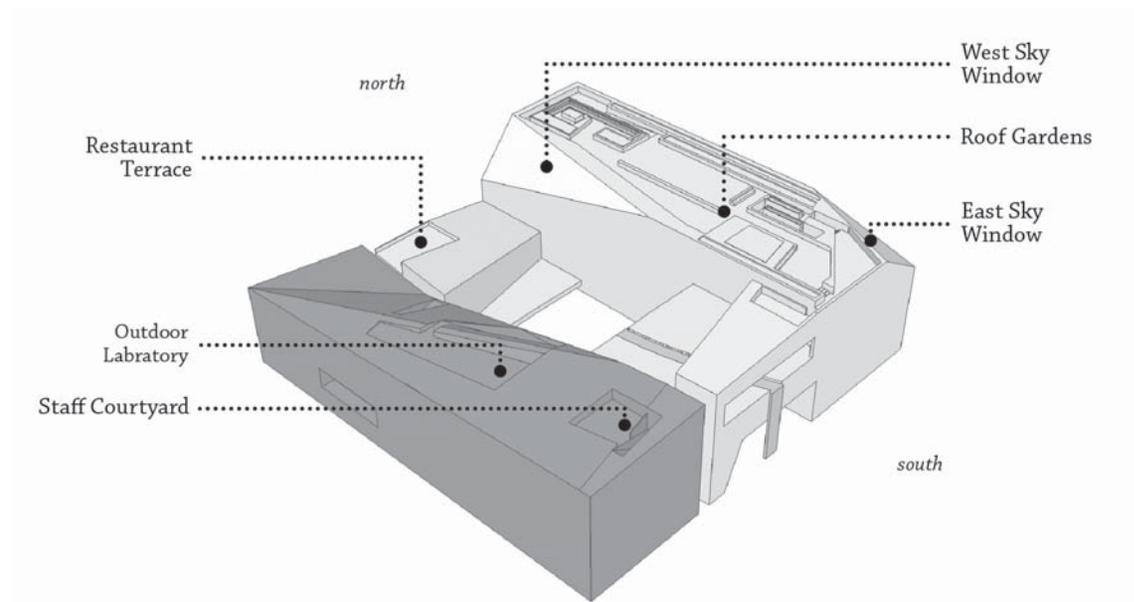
Transfiguration 11: *Carving of the Roof Plan.
